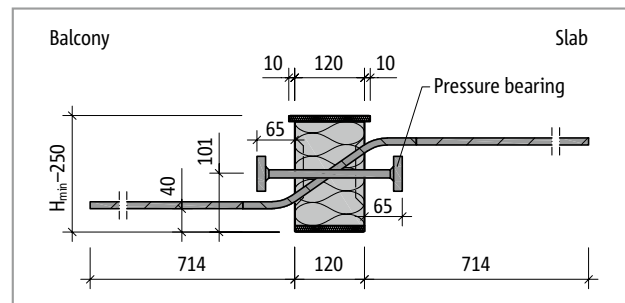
Schöck Isokorb® XT type Q-P-V5: Cross-section of the product
